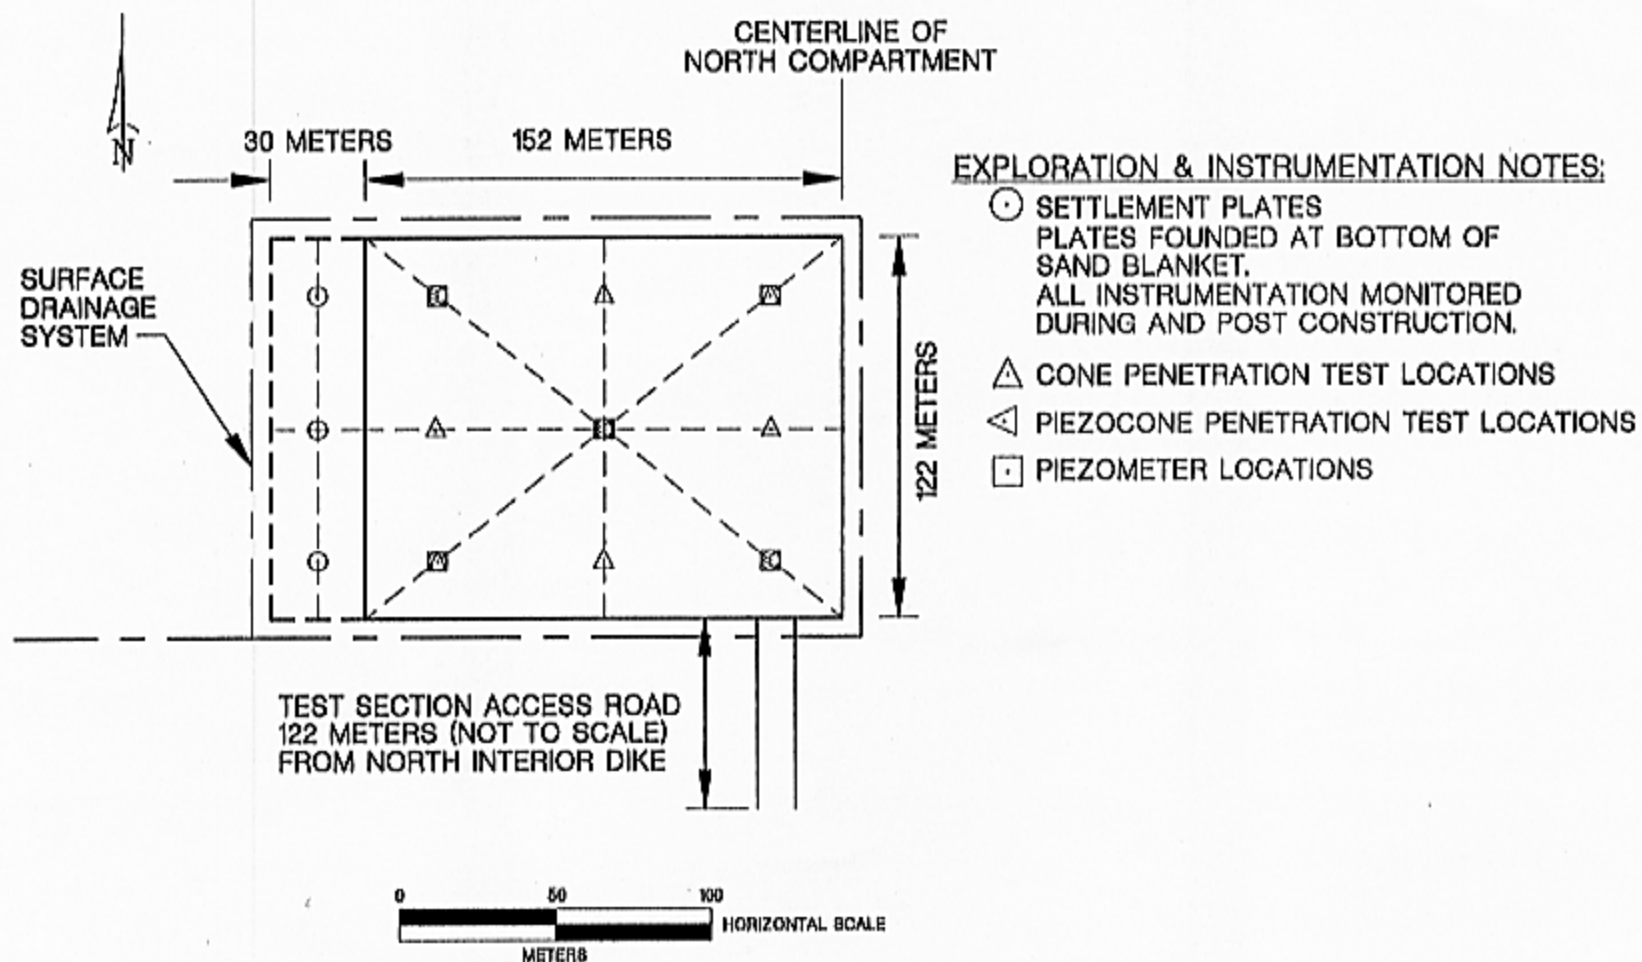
Plan View of Strip Drain Test Section and of Subsurface Exploration and Instrumentation at Craney Island
